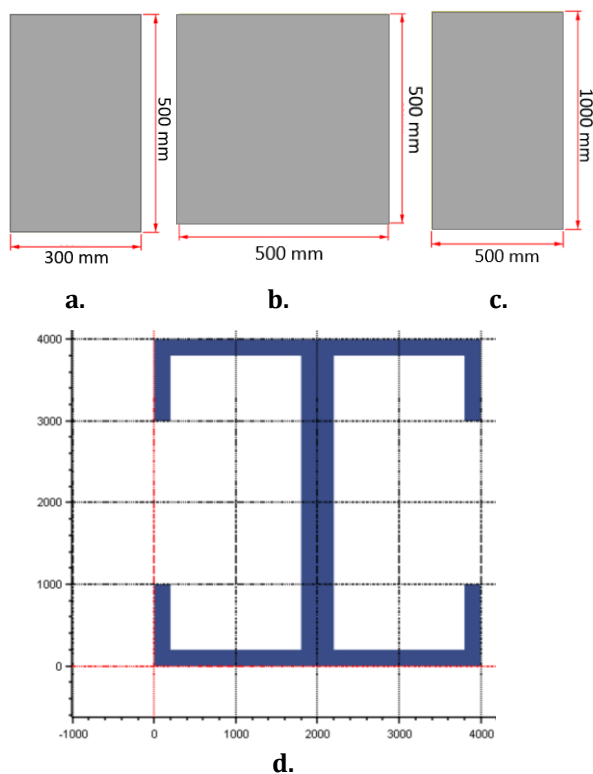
Sizes of the beams and diagonal elements (a), columns (b), top belt and outrigger (c), and core wall (d).
